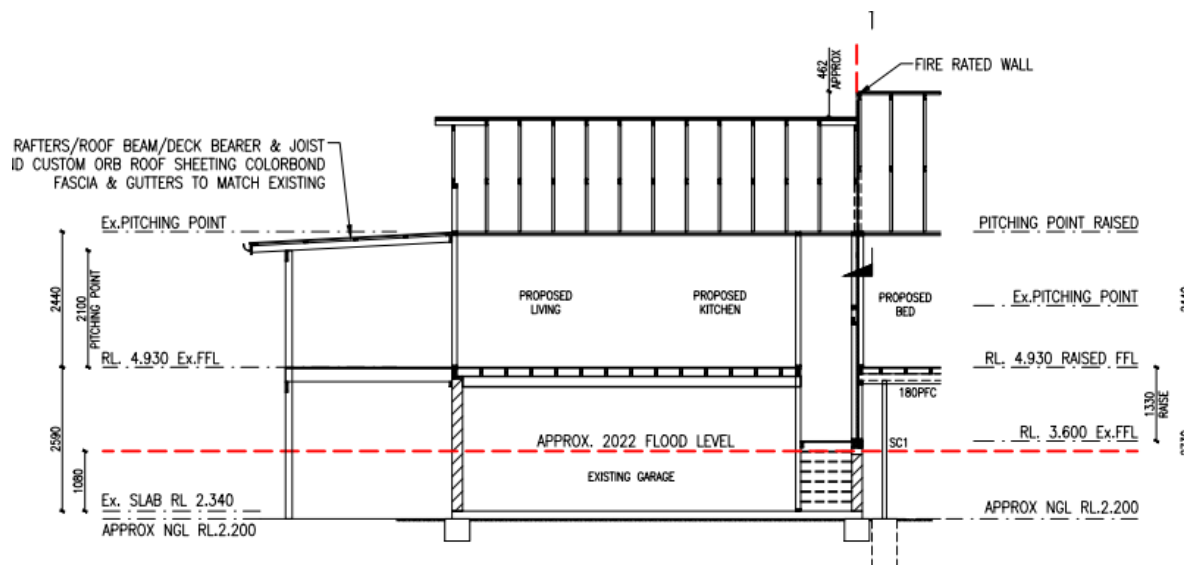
Proposed and existing building floor levels. (Source: Byron Shire Council GIS).
